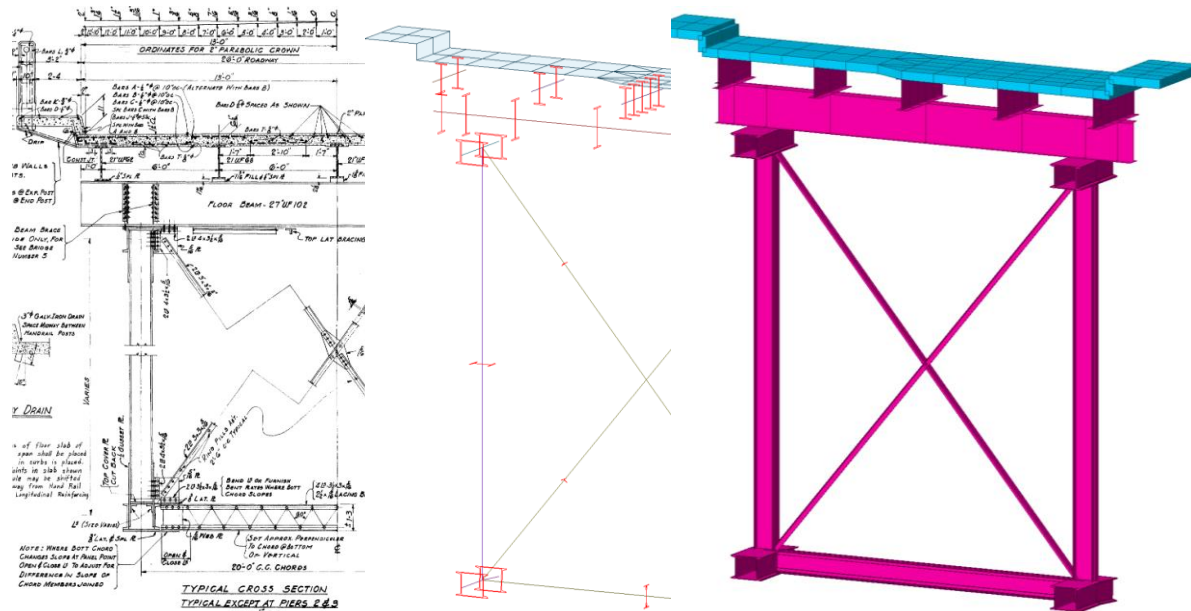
Schematic of typical cross section: technical drawing (left) and FE model (right) - Truss_3
